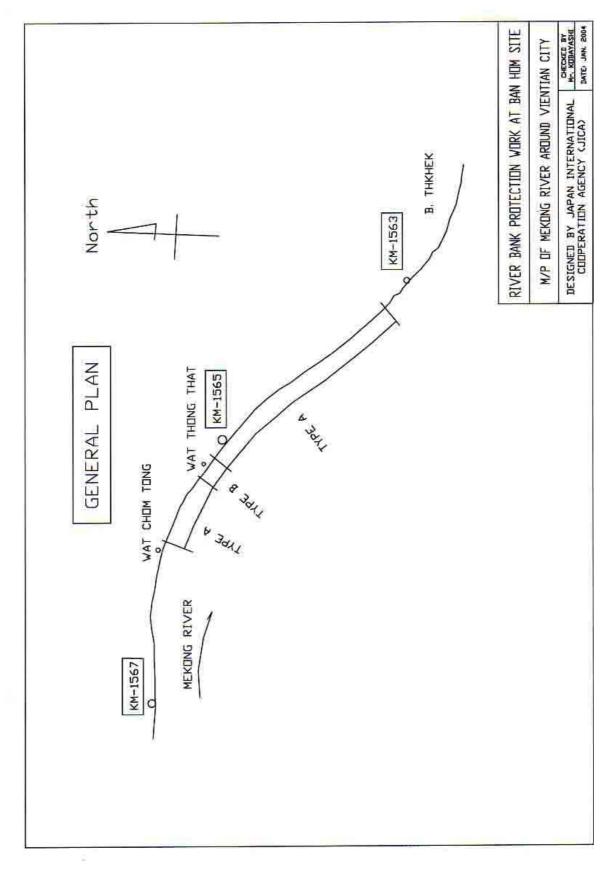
General Plan of Riverbank Protection Work at Ban Hom Site
